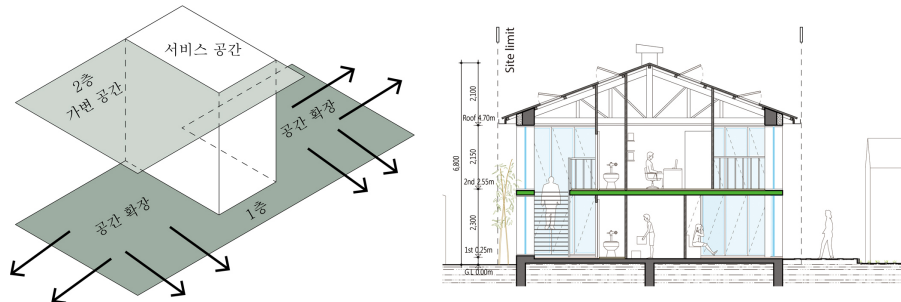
Concept Diagram \_ Senior Centre Plan & Section
